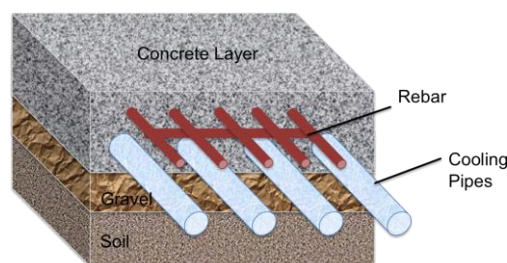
A cross section of the interior of a concrete slab with cooling pipes [2,11]
